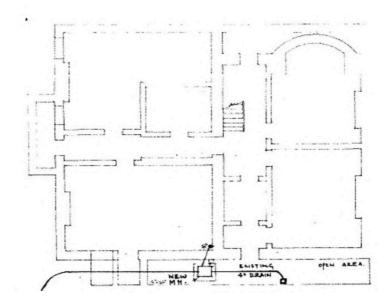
1945 Basement Drainage Plan (Camden Archives) showing historic opening to passage.
